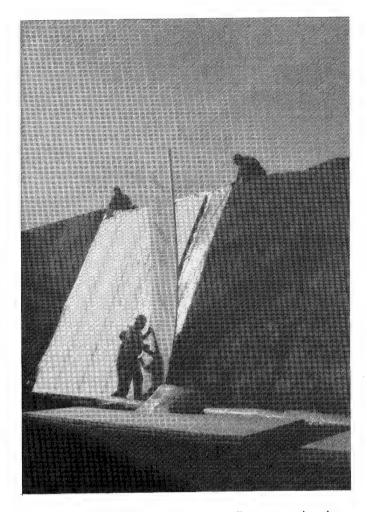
Placing insulation over first vapor barrier, Joliet Channel Wall
